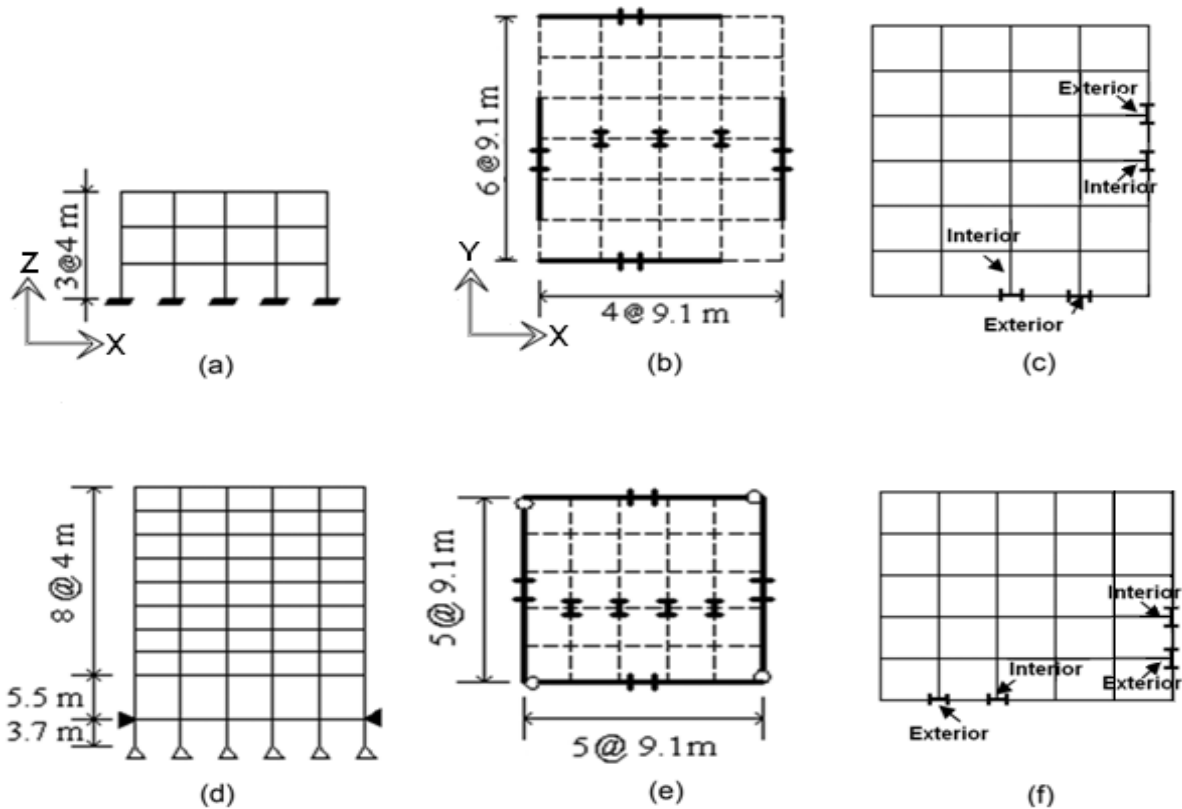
(a) and (b) elevation and plan for Model 1, (d) and (e) elevation and plan for Model 2, (c) and (f) studied elements for Models 1 and 2
